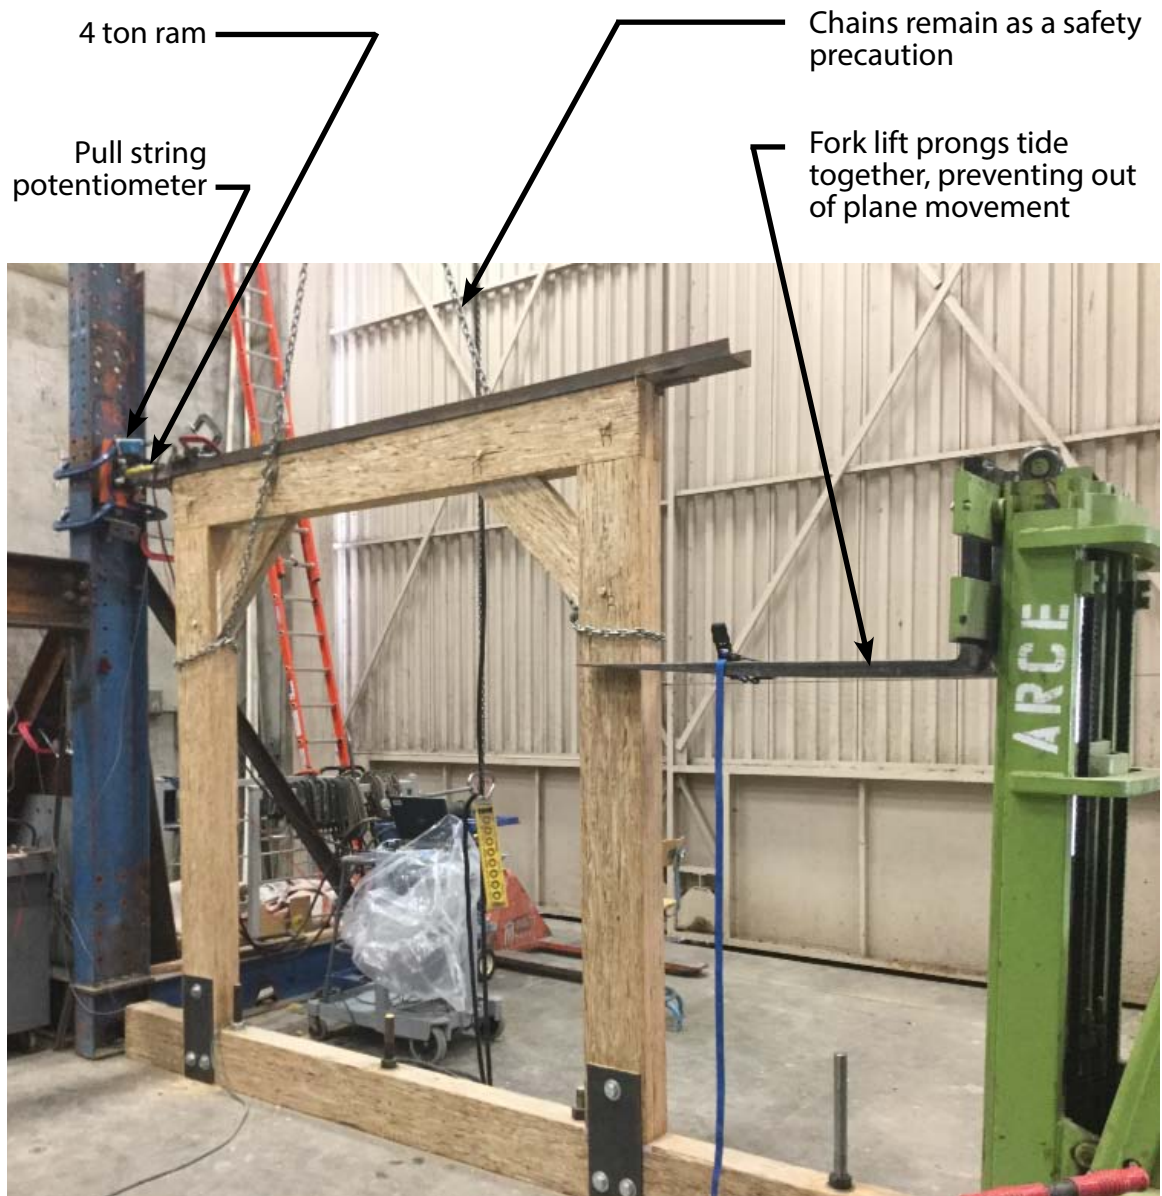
Frame testing arrangement set up in the High-Bay lab at Cal Poly.
